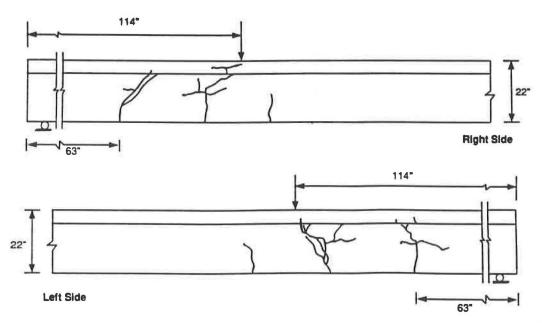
Crack Diagrams for Test 10. (Beam 8, End A, 2.0 Inch Strand Spacing, Pour 1 - Normal Strength Mix, Unconfined, 114 Inch Embedment Length, Bond Failure.)
